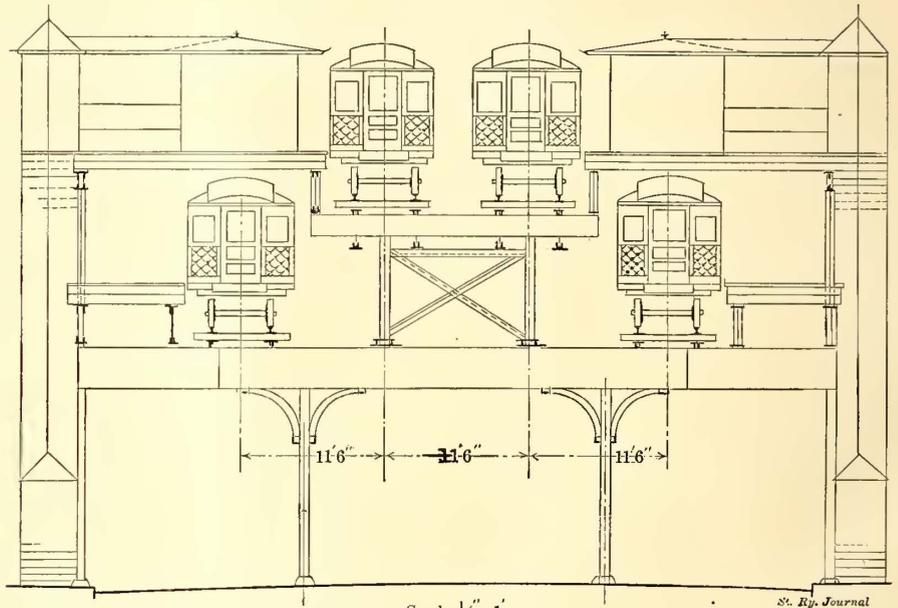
CROSS-SECTION AT 125TH STREET, ON THE SECOND AVENUE LINE
